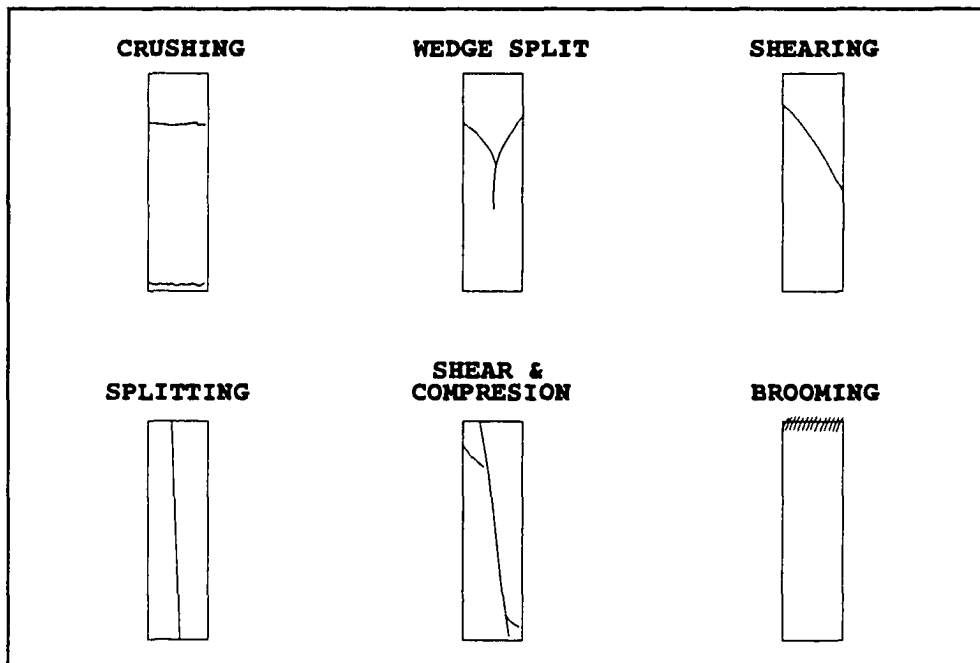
SHORT COLUMN FAILURES
